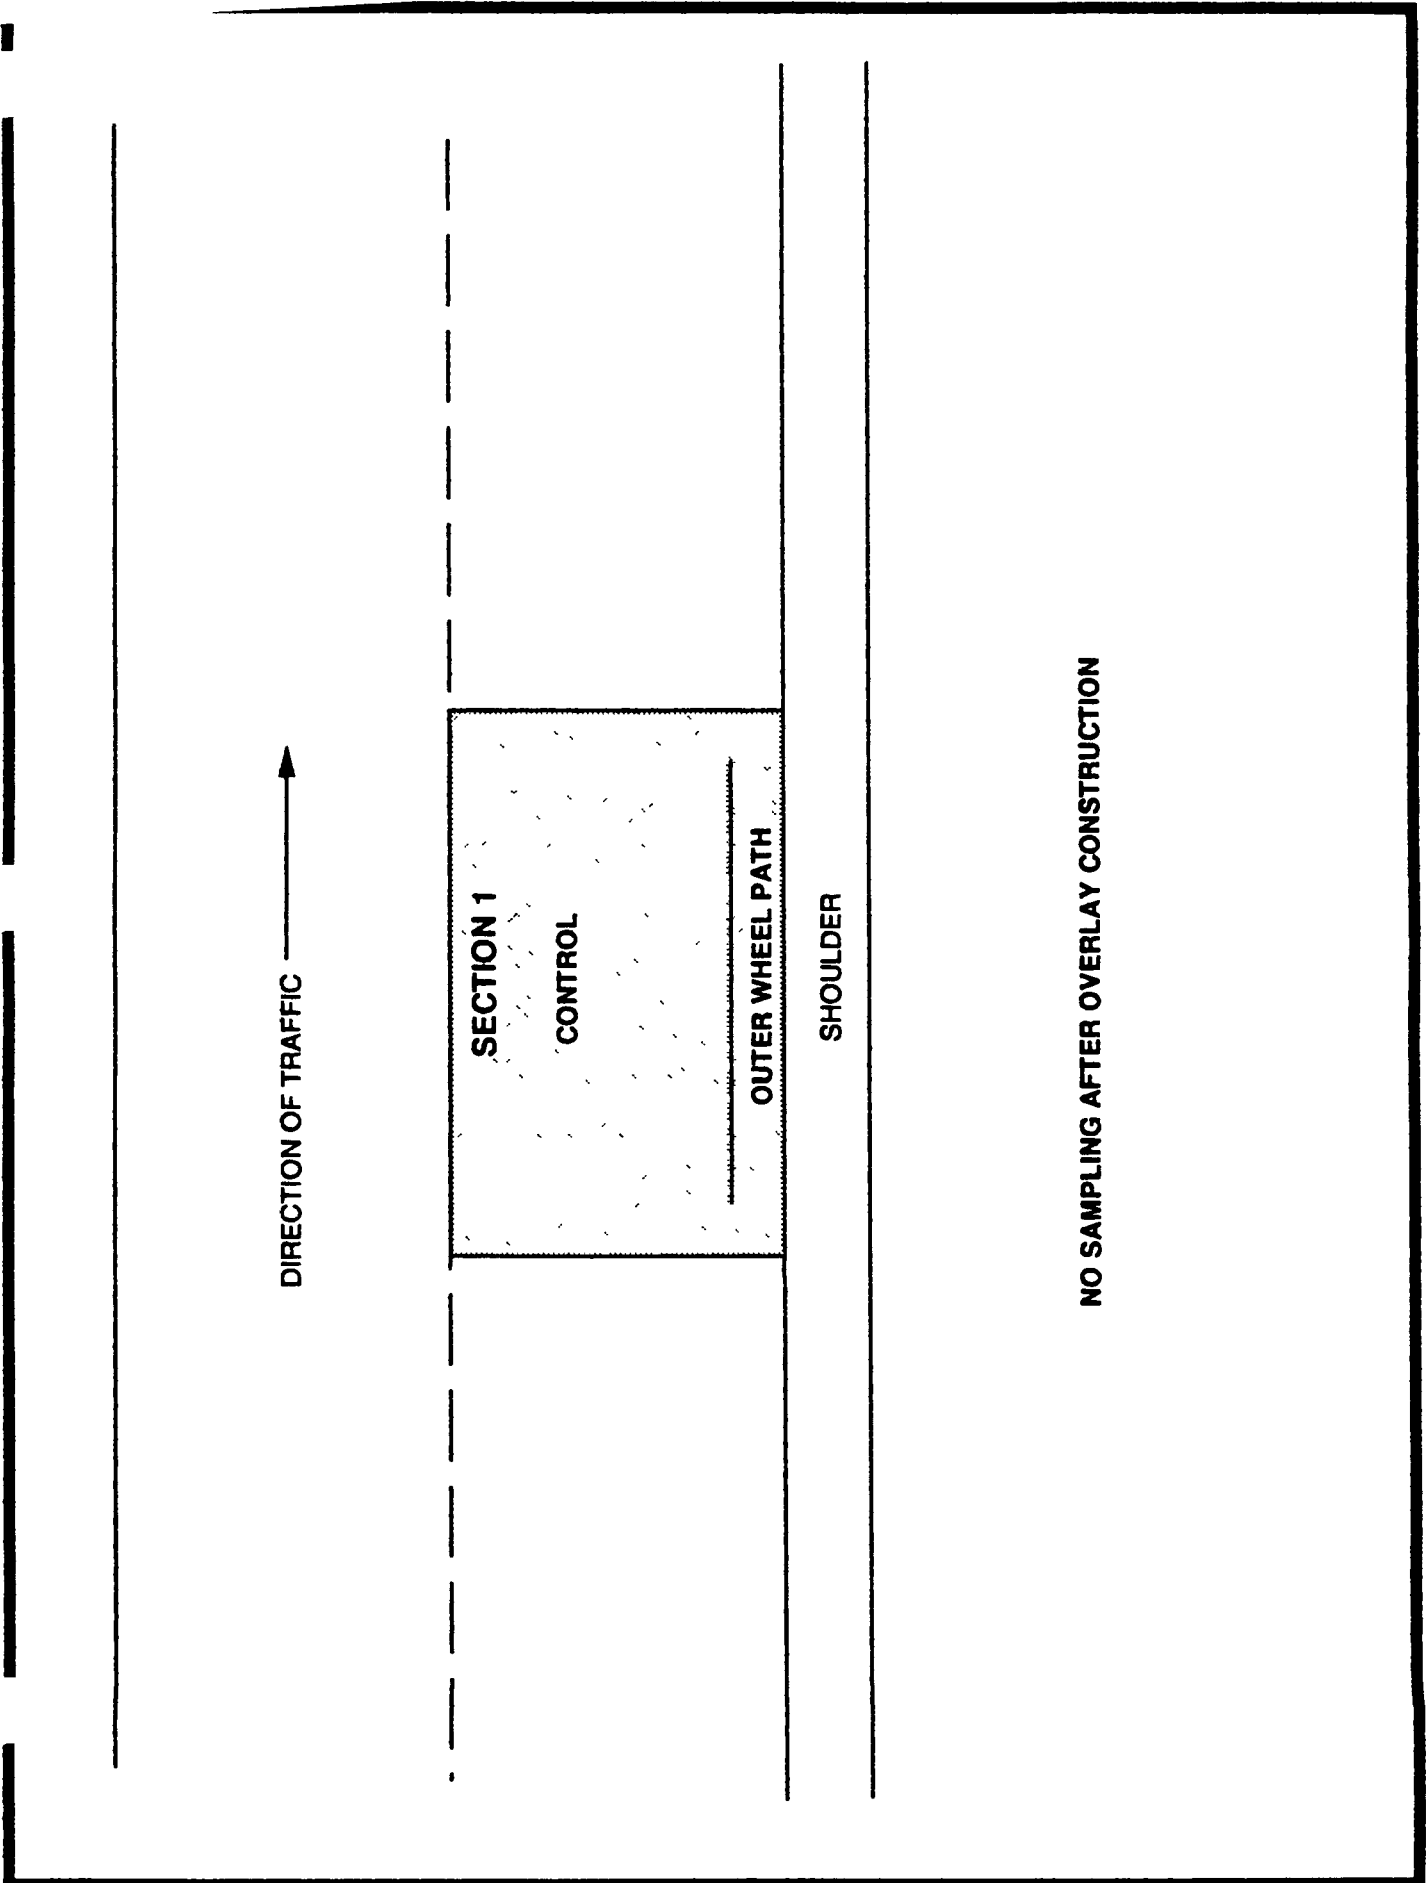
Example of "Post-Construction" Sampling Plan for Section 1
